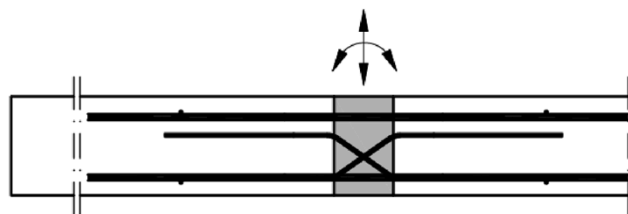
Schöck Isokorb® Type Q, Q-P for supported balconies (alternatively with bent bar end on the ceiling side); Schöck Isokorb® Type Q-Z , Q-PZ (without compression element) for constraint-free applications, for example loggias with opposite slab connections, see Fig. B.3
